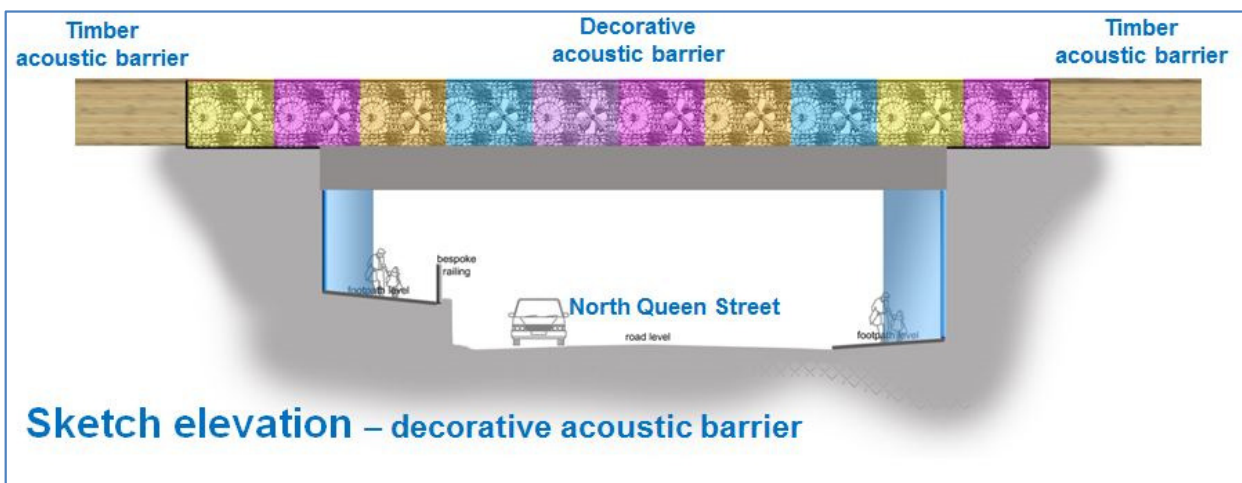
Southern elevation of proposed widened North Queen Street Bridge
